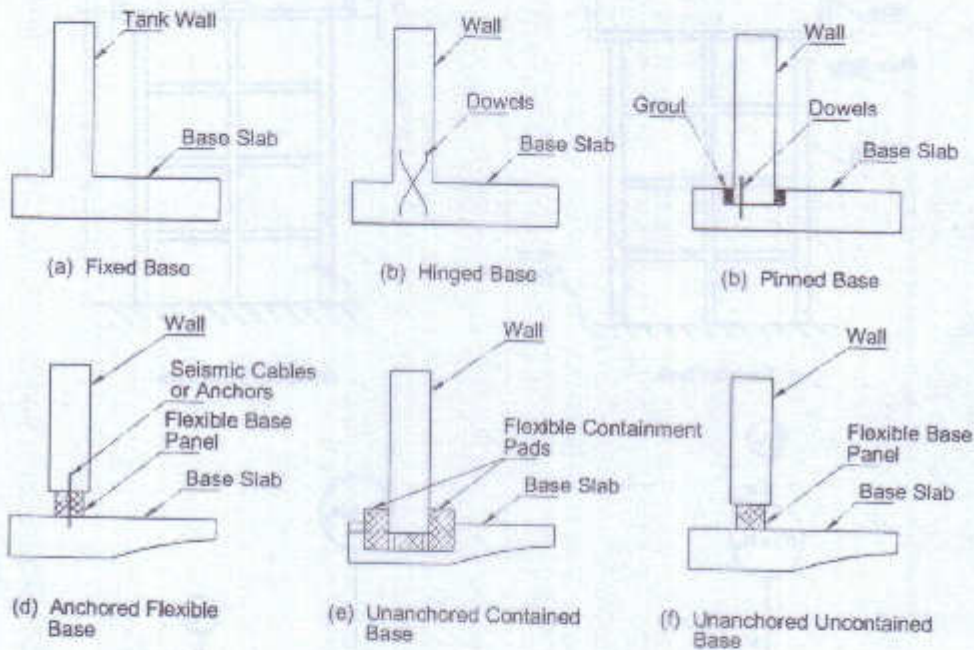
TYPE OF CONNECTIONS BETWEEN TANK WALL AND BASE SLAB
